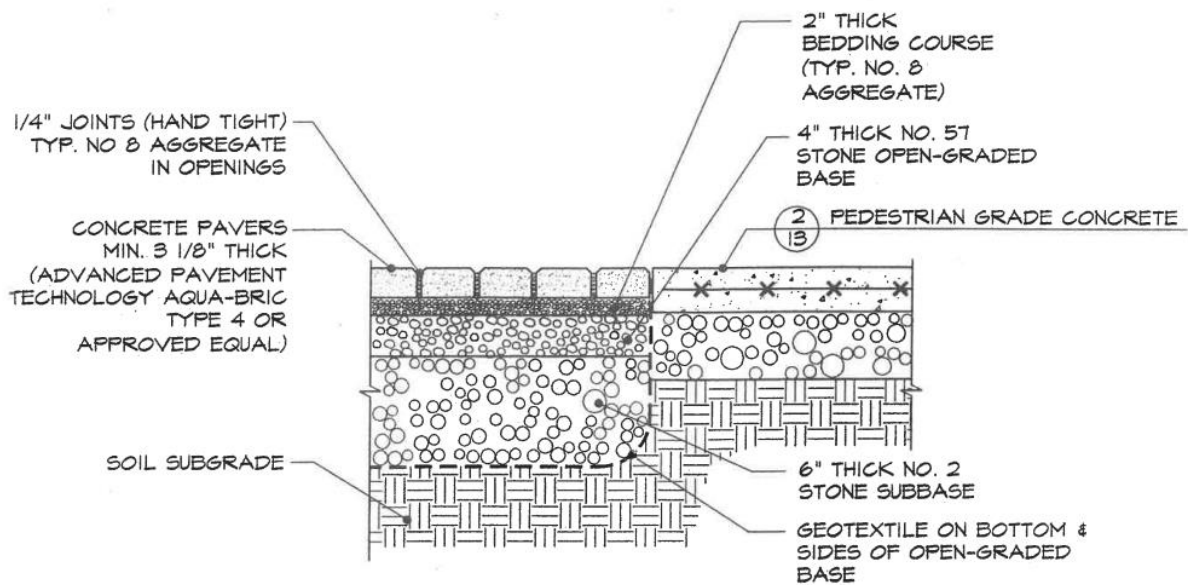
Cross section of PICP design provided for Student Plaza Drive location (Fred Adams Paving Co., Inc. 2016)
